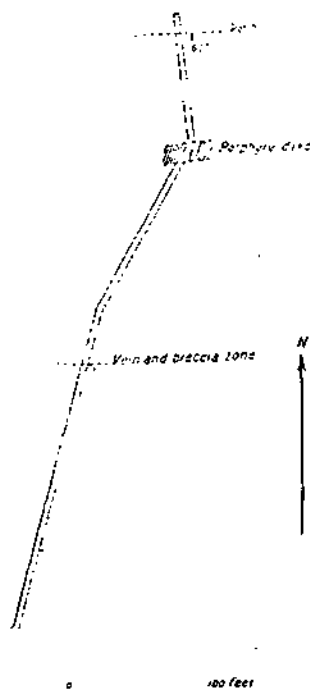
Sketch plan of lower tunnel of the Zulu Chief mine.
